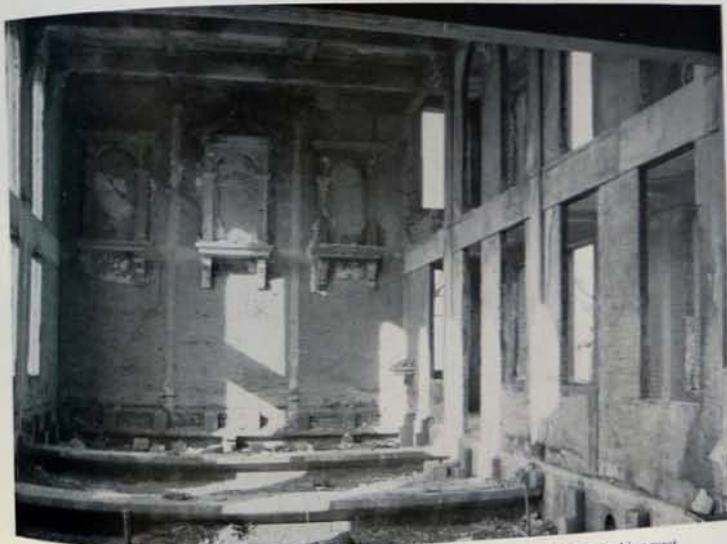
4,800 feet from GZ. Group 7, Building 1, damage on first floor, looking west.
